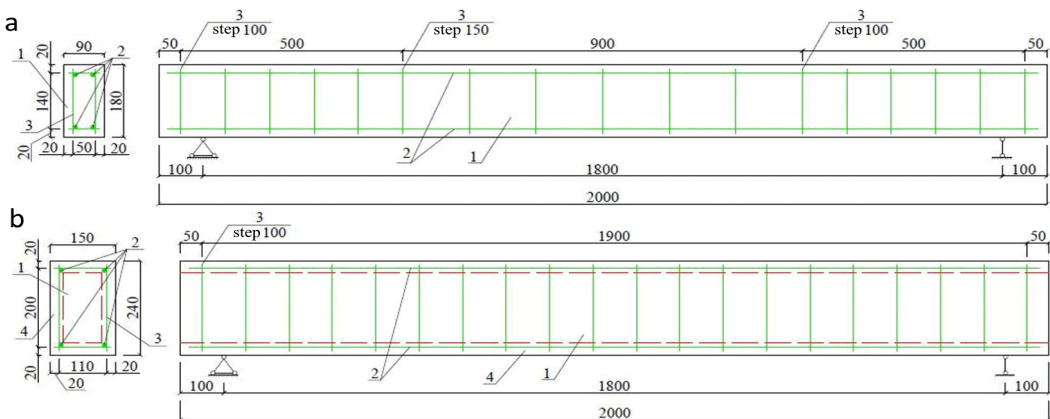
Construction: a) conventional bending element; b) cage-reinforced bending element; 1 – concrete B25; 2 – longitudinal reinforcement Ø10 A400; 3 – transverse reinforcement Ø3 B500; 4 – concrete reinforcement B25
